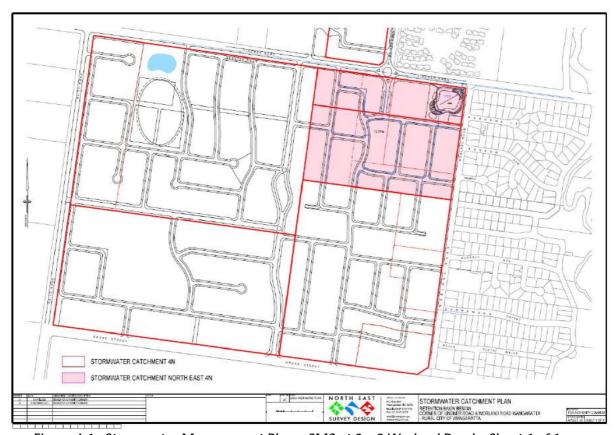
Stormwater Management Plan - SMC at 2 - 8 Worland Road - Sheet 1 of 1
